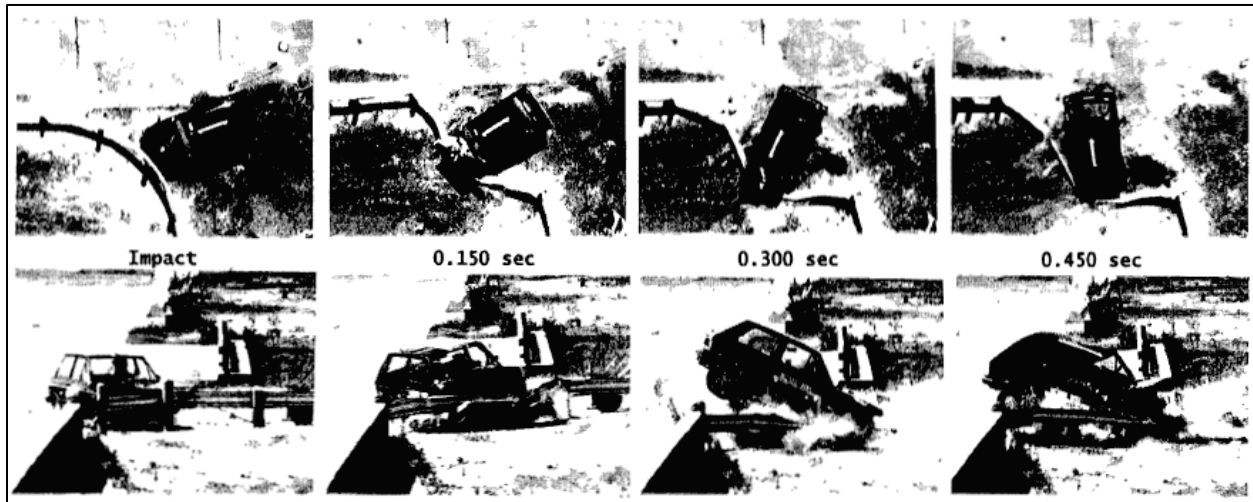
Sequential Photographs for Test 1263-1 (5).
